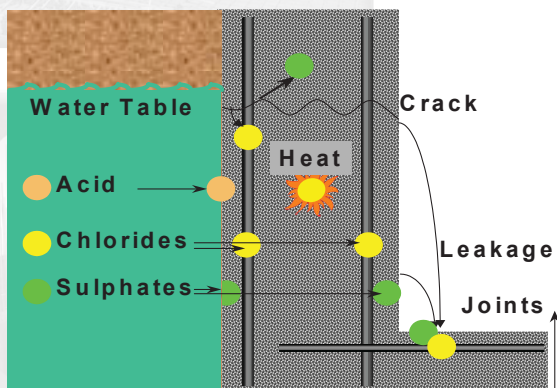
Diagrammatic view of a basement showing serviceability criteria. The addition of Microsilica 600 to the concrete ensures improvement in all areas.
